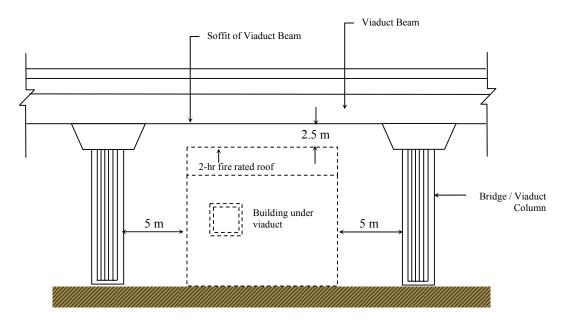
Clearance of building roof below bridge/viaduct (Longitudinal Section)
